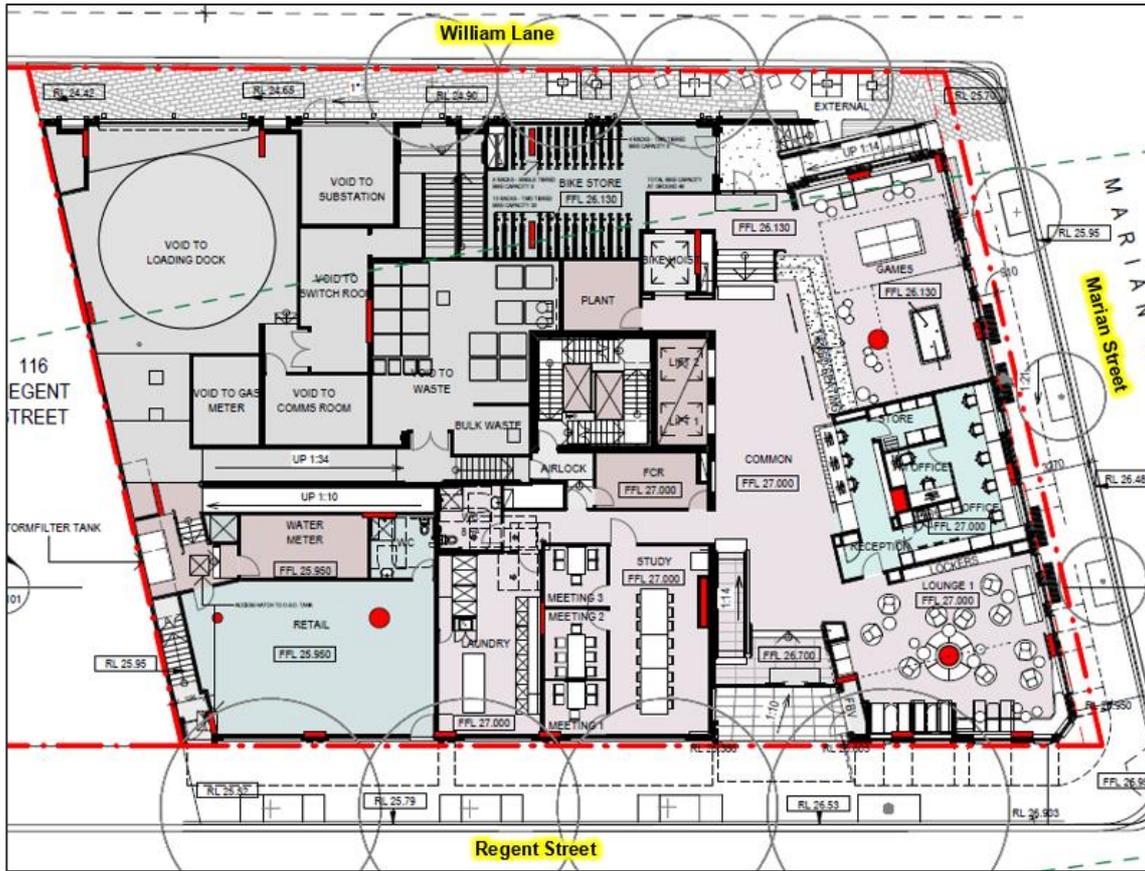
| Ground floor (Level 1) plan (source: Addendum RRTS)
